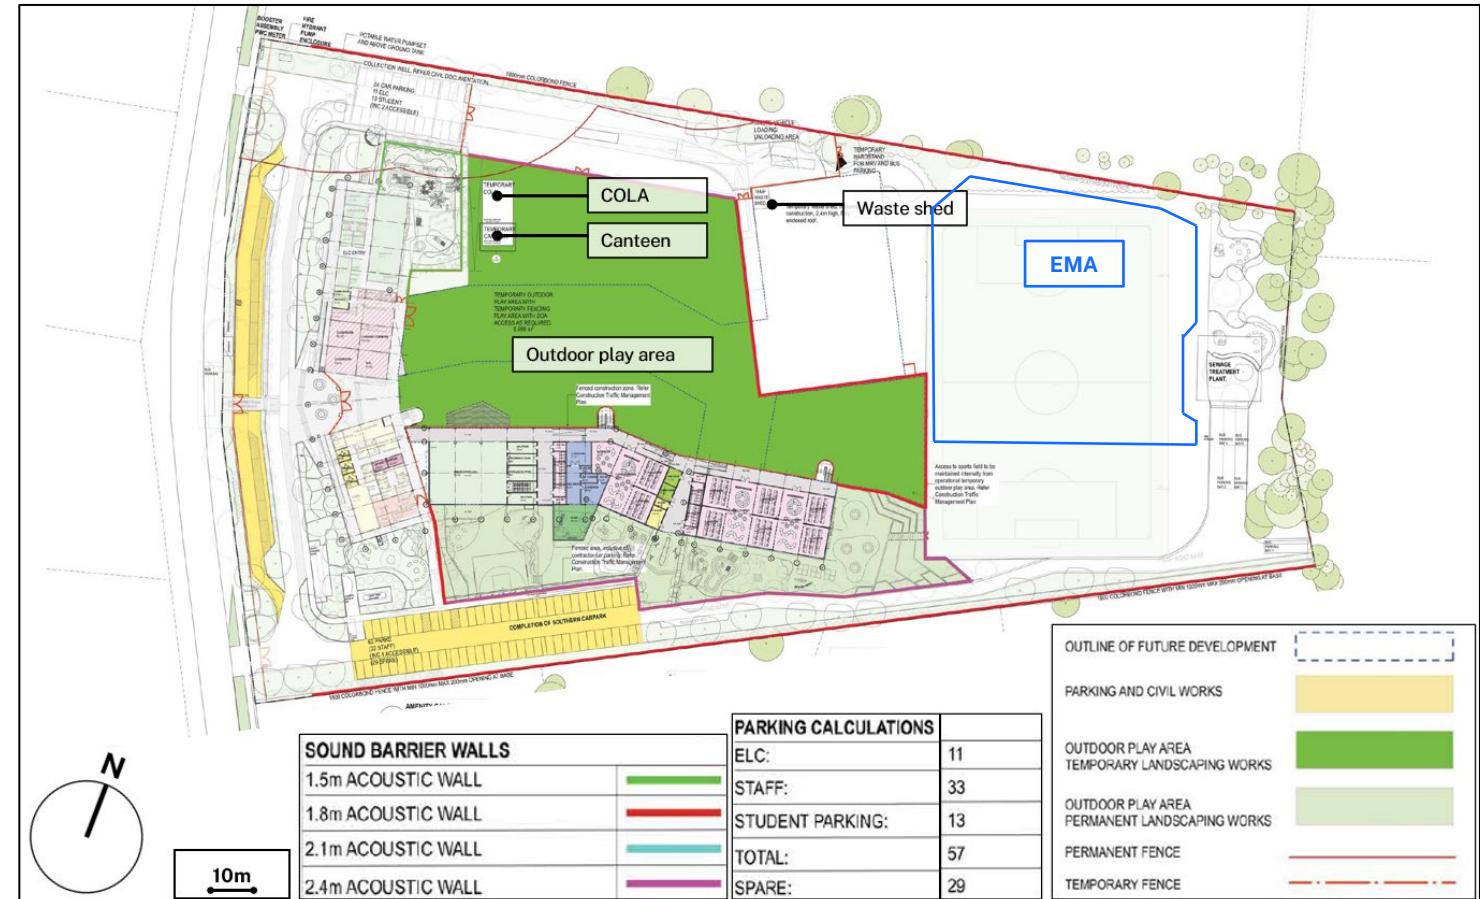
Ground Floor Plan (Source: Applicant's ARtS, 2025)
